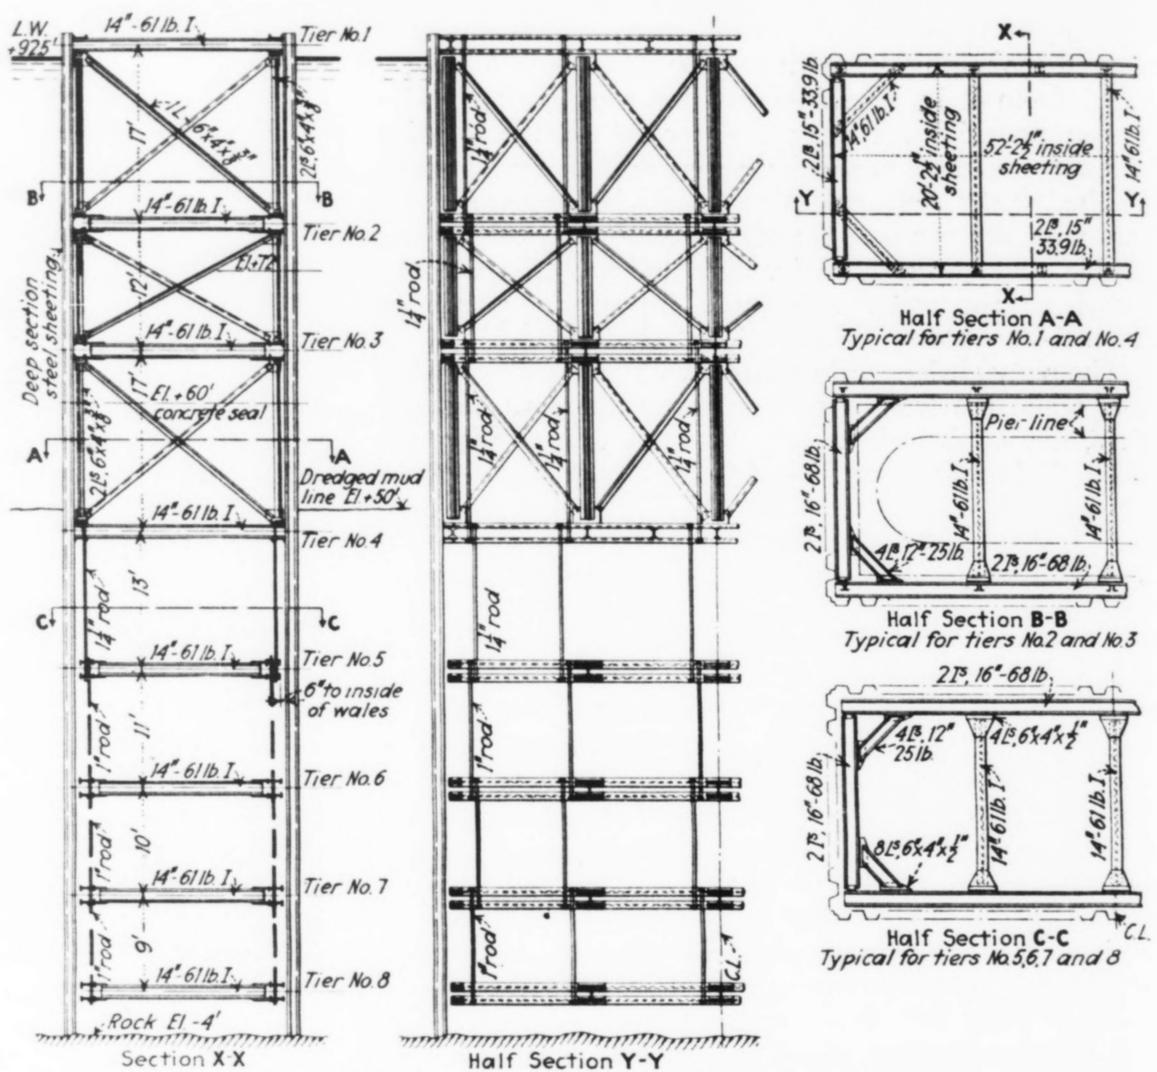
DETAILS OF STEEL COFFERDAM BRACING
